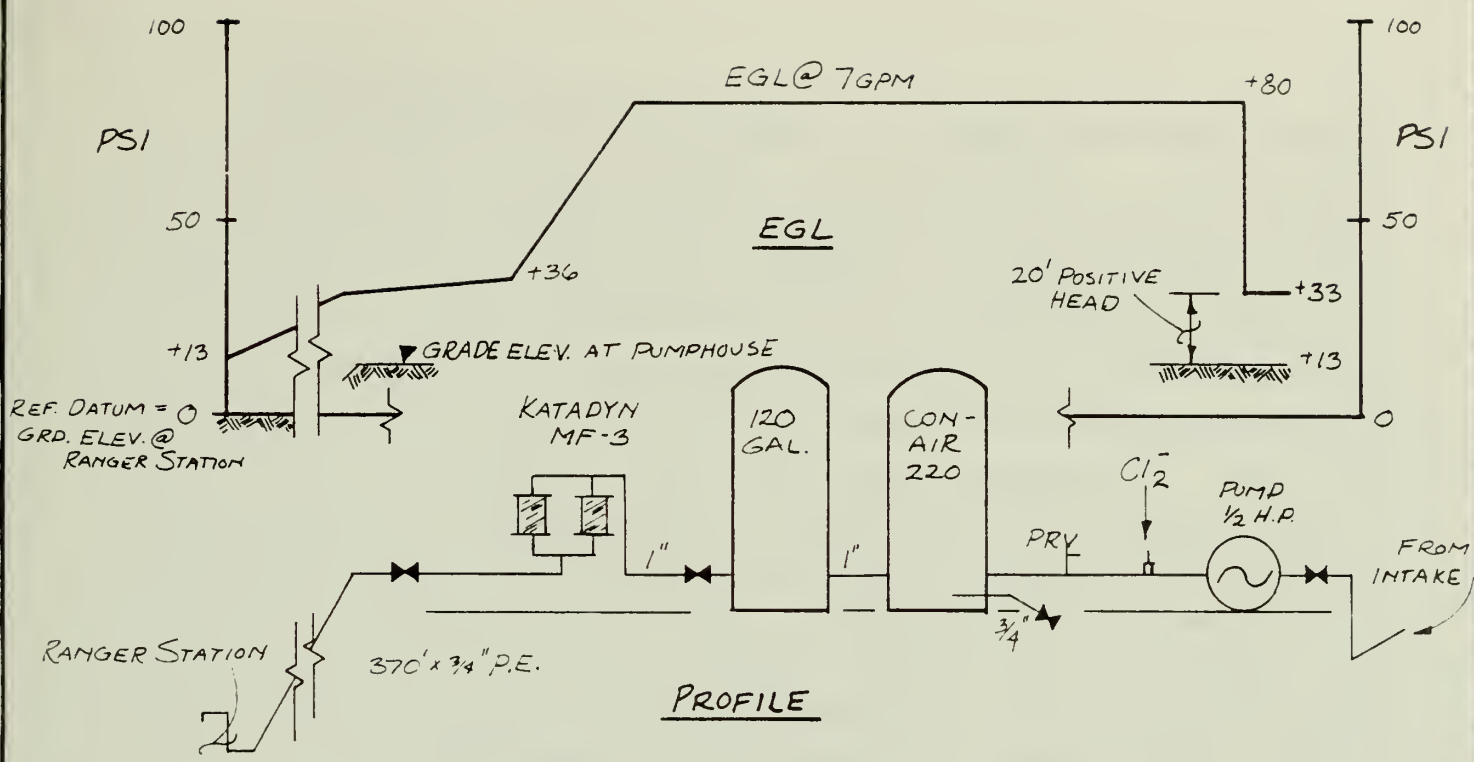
WILD BASIN - LAYOUT OF SYSTEM BEING CONSTRUCTED
